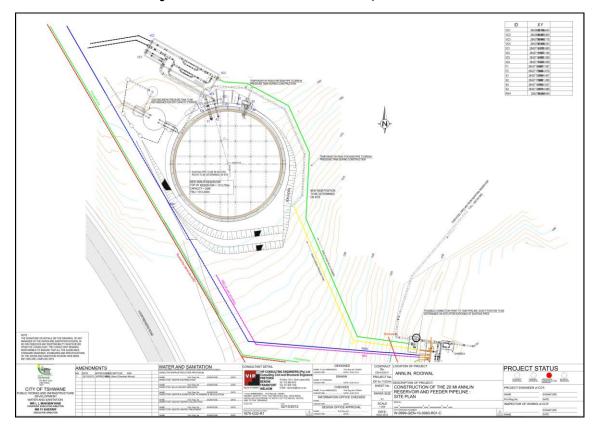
Plan of infrastructure currently constructed for the Annlin Reservoir facility.
